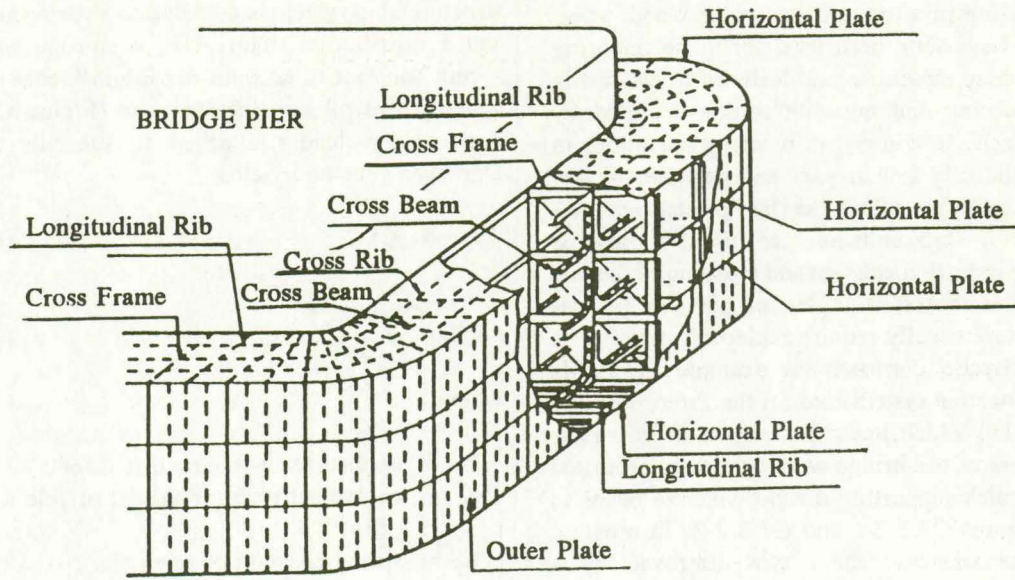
Framed Steel Fender System for Bisan-Seto Bridge, Japan [9].
